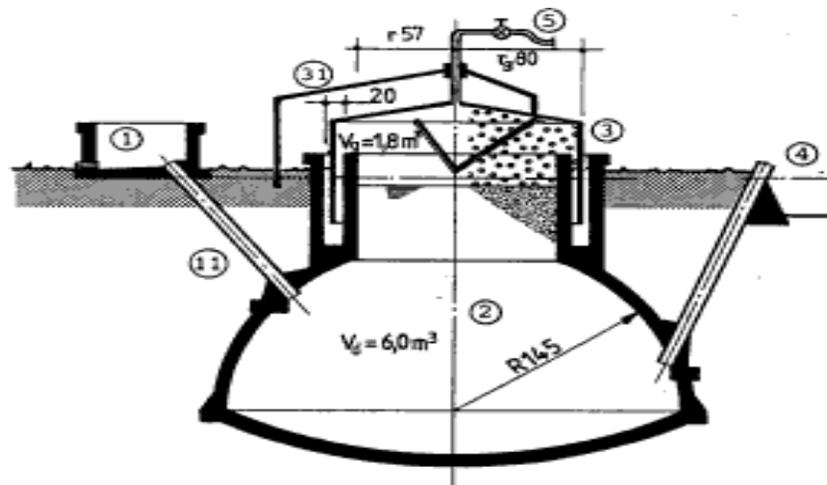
Water-jacket plant with external guide frame. 1- Mixing pit, 11- Fill pipe, 2- Digester, 3-Gasholder, 31- Guide frame, 4- Slurry store, 5- Gas pipe.
